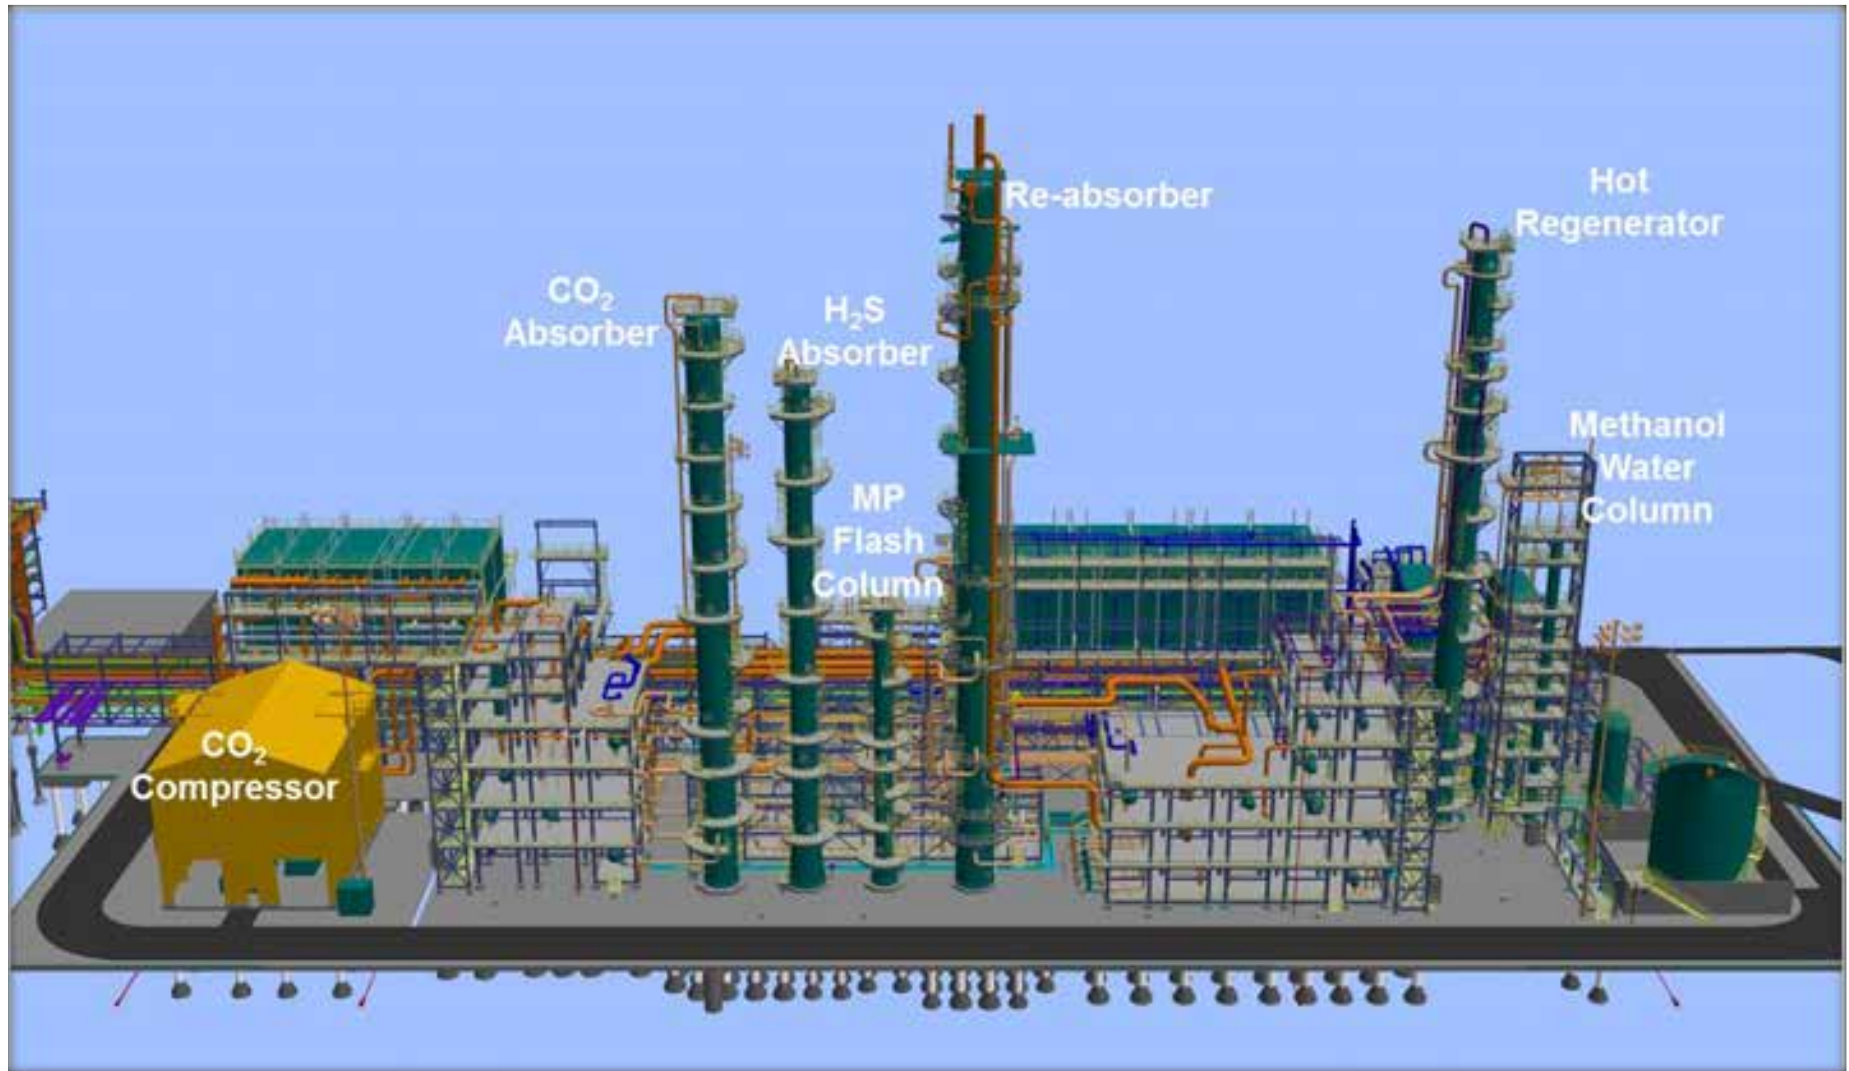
3D NW View of CO₂ Piping Layout
